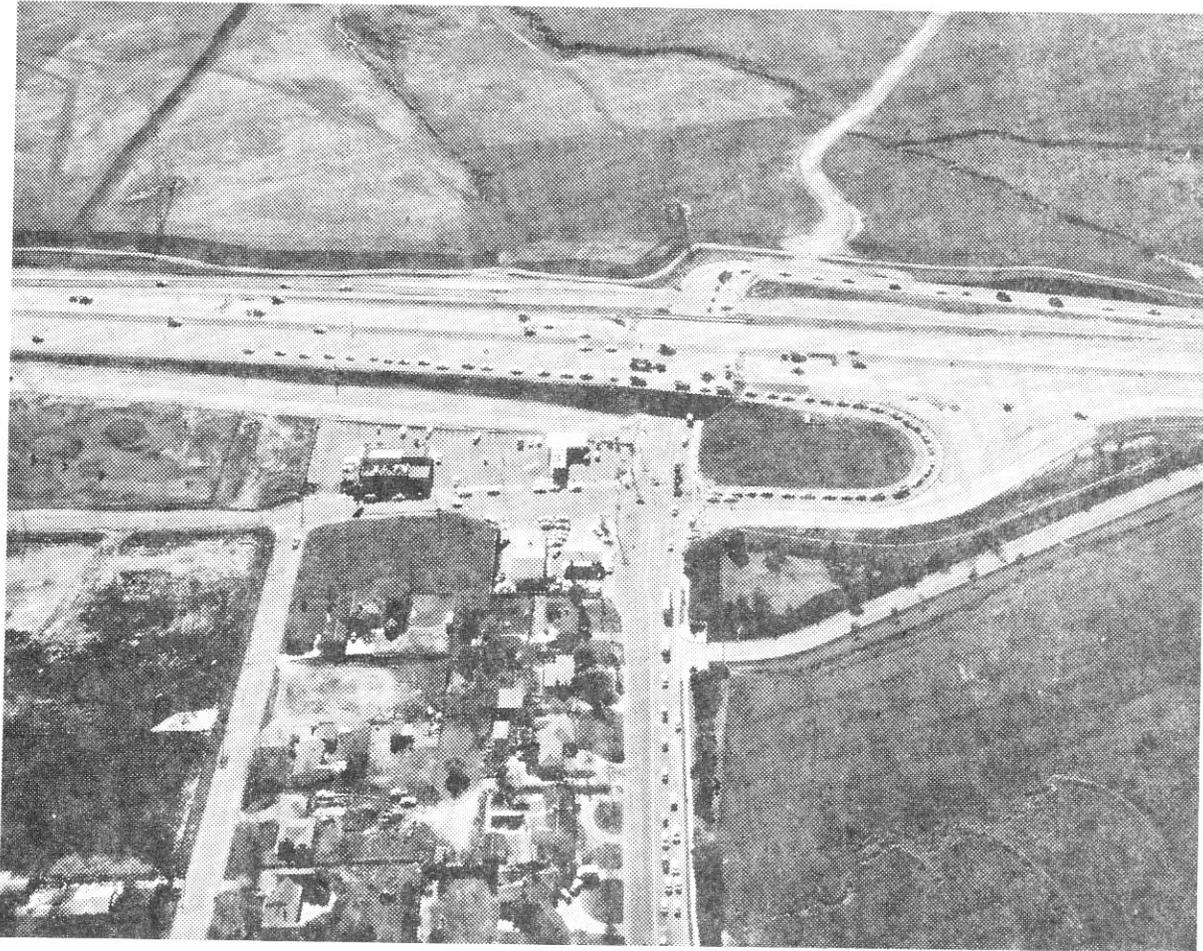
Looking westerly at the Route 5/Roxford Street Interchange.
